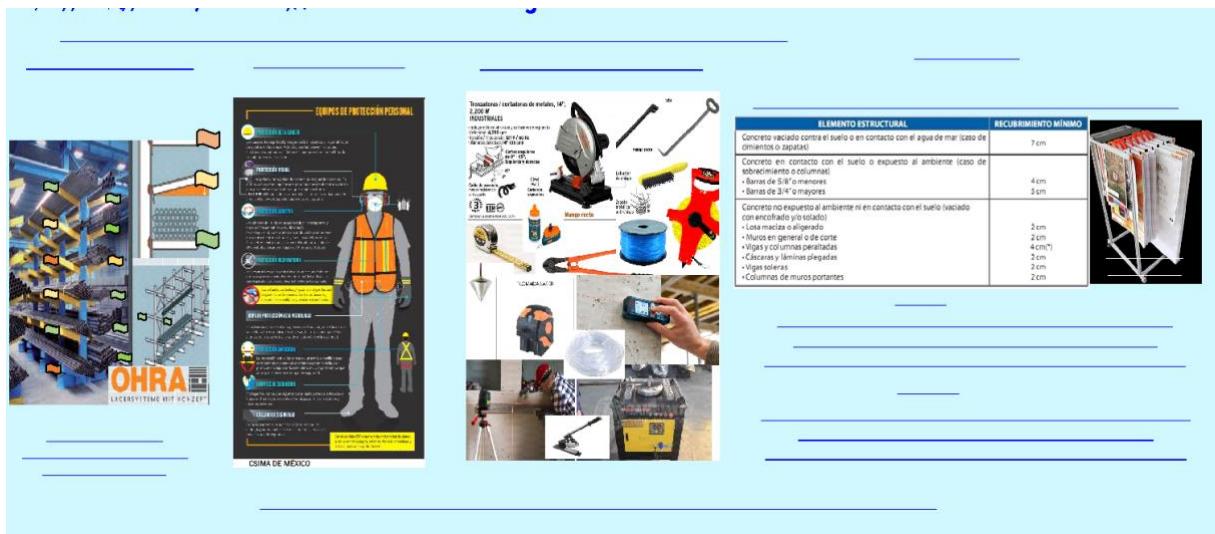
Board No.1: Reinforcement of structural elements with reinforcing steel-
